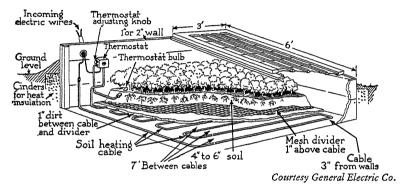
Cross section of an electrically heated hotbed, showing details of construction. Hardware cloth or wire netting is sometimes placed 1 inch above the hotbed cable to protect it from injury from spades, trowels, etc.
